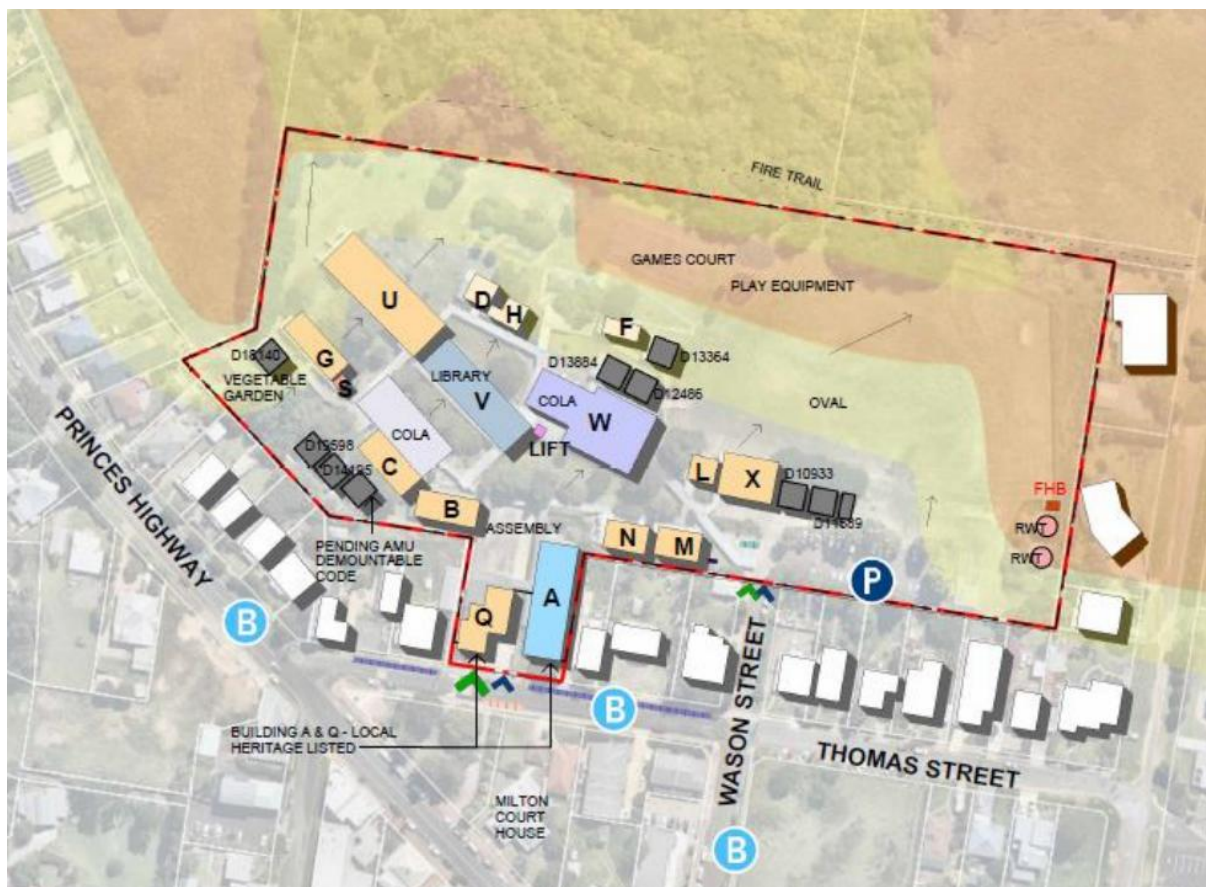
Milton Public School, showing designation of buildings. Buildings A and Q are identified as heritage items. (Source: Milton Public School Upgrade Study, existing site plan, dated 20.07.2023).
